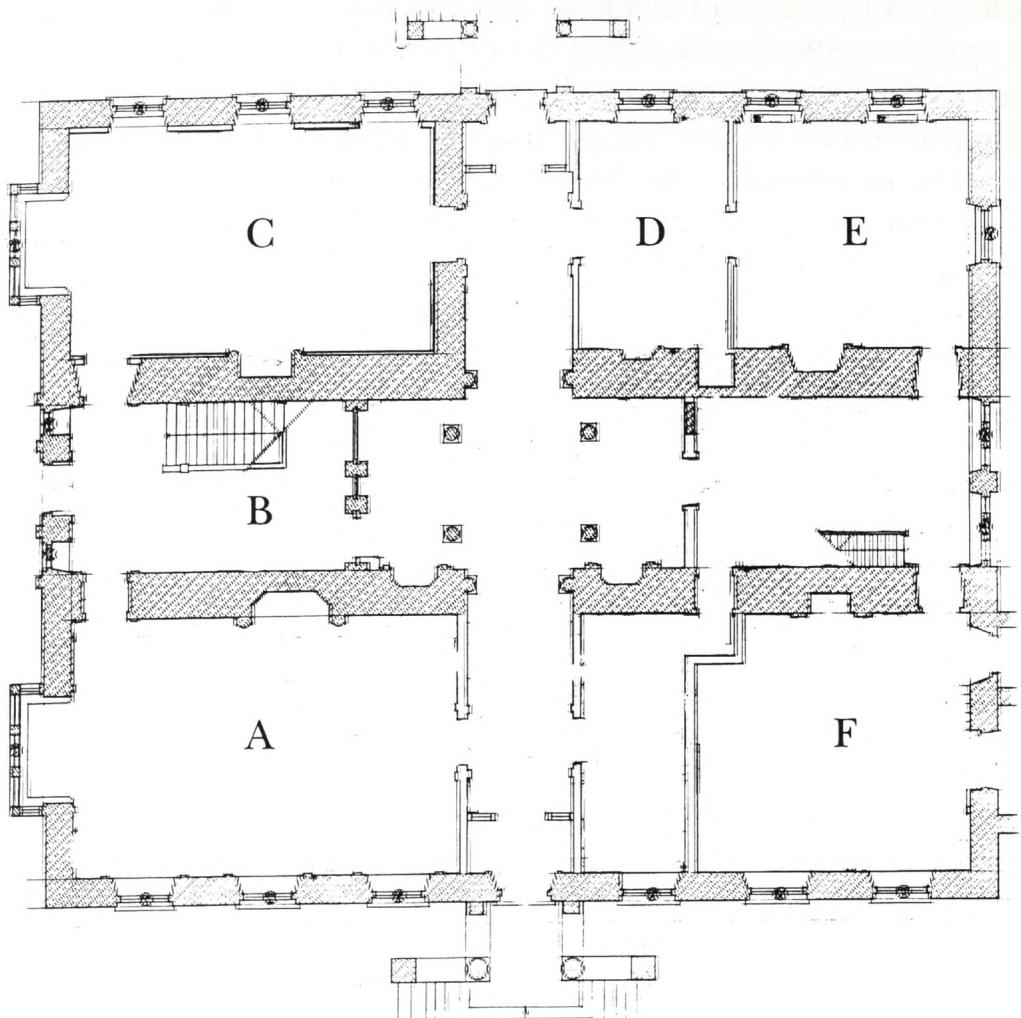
Ground-floor plan of Thorp Hall (Freeland Rees Roberts).
